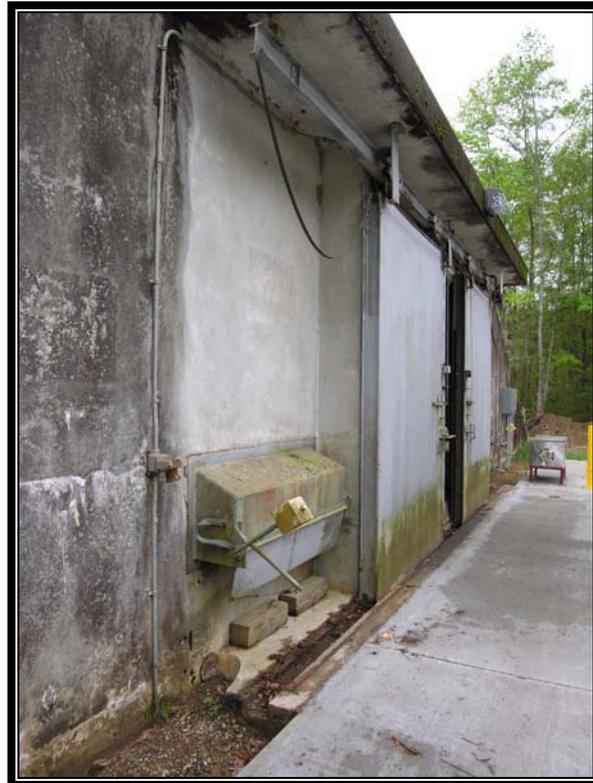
Sliding doors of typical Stradley magazine (Courtesy U.S. Army, 2007)
